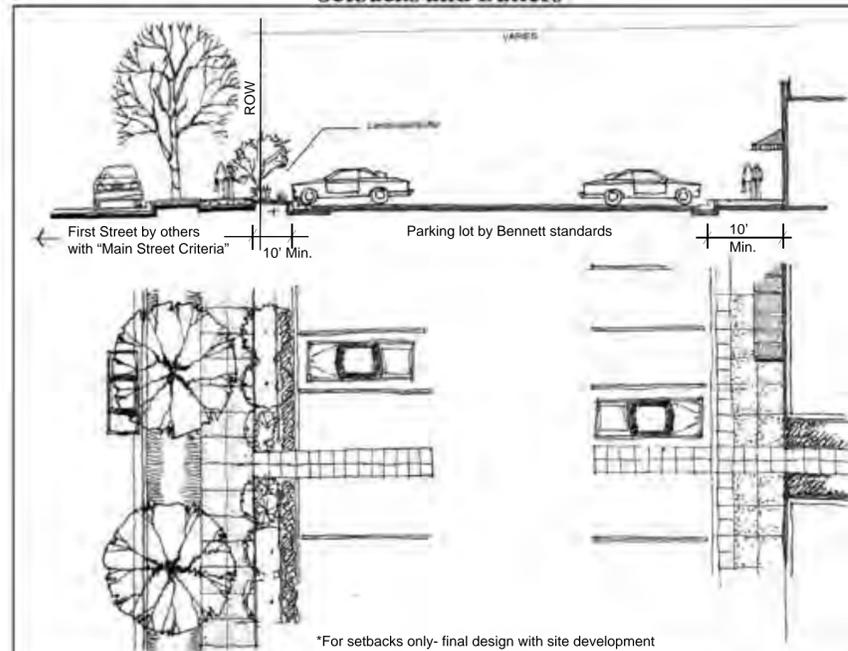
SH-79 South First Street Parking Lot Setback PA - I
